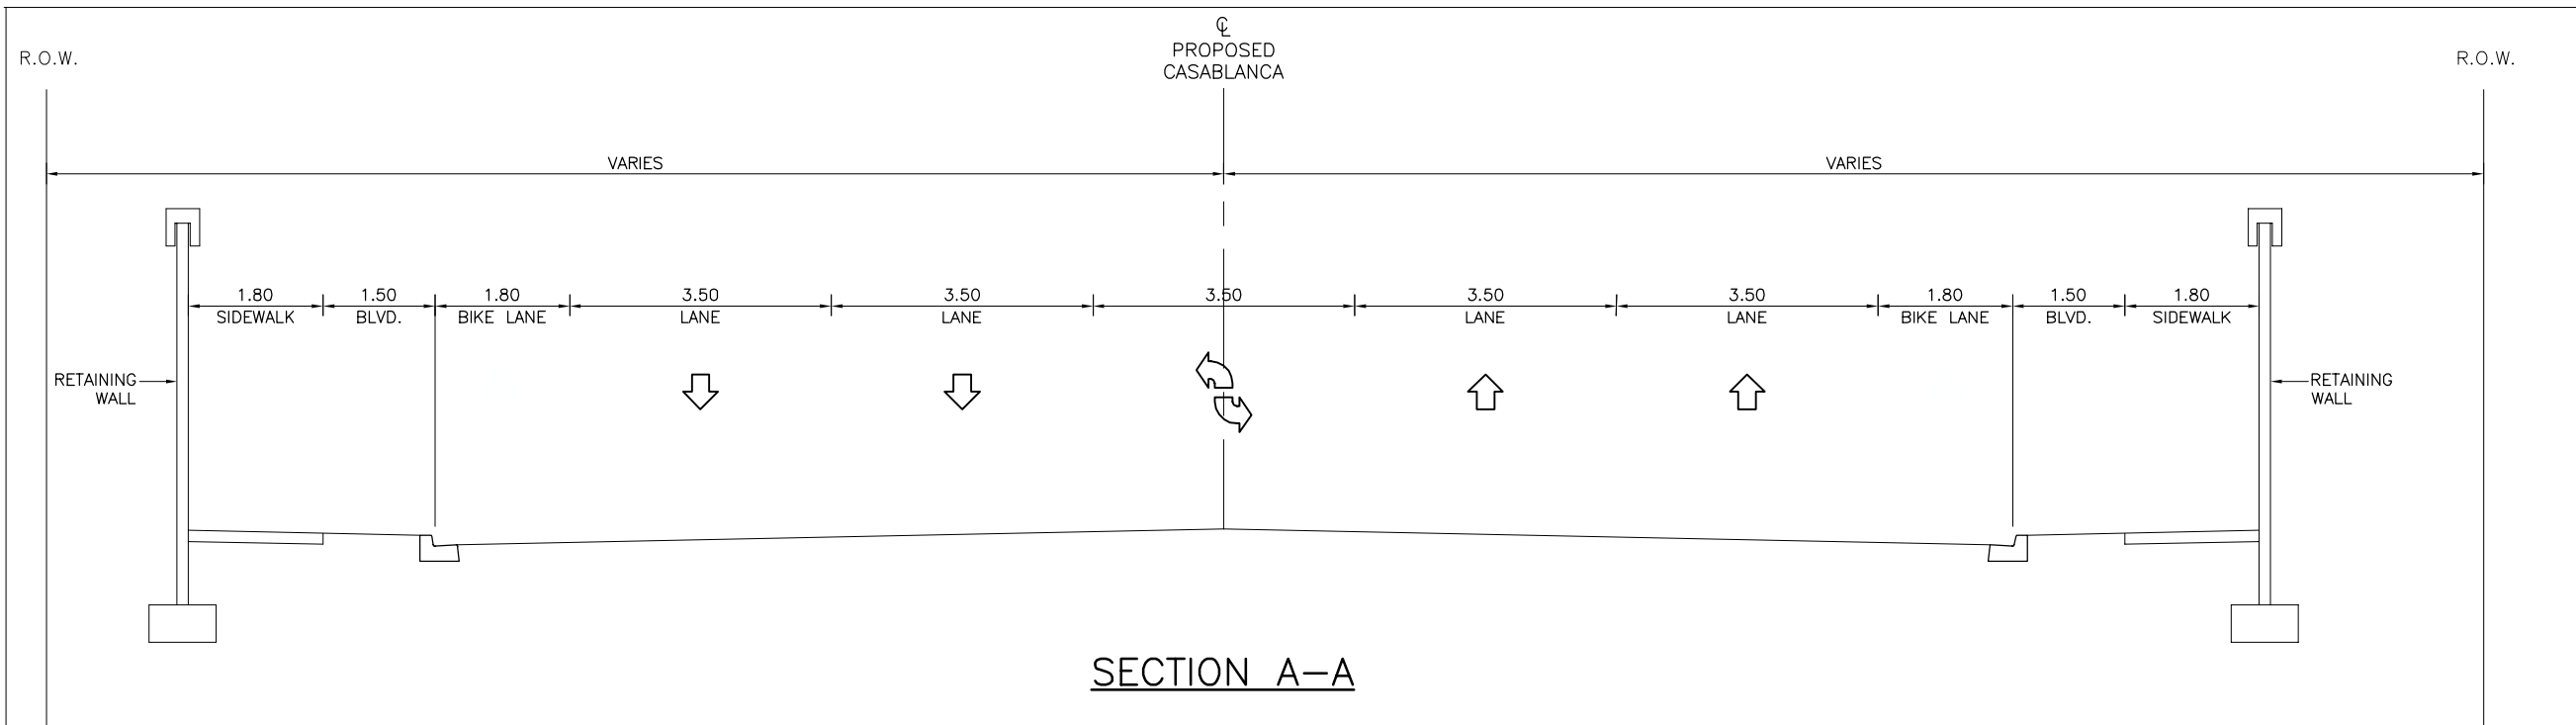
Cross Section of Alternative B – Underpass Grade Separated Crossing
